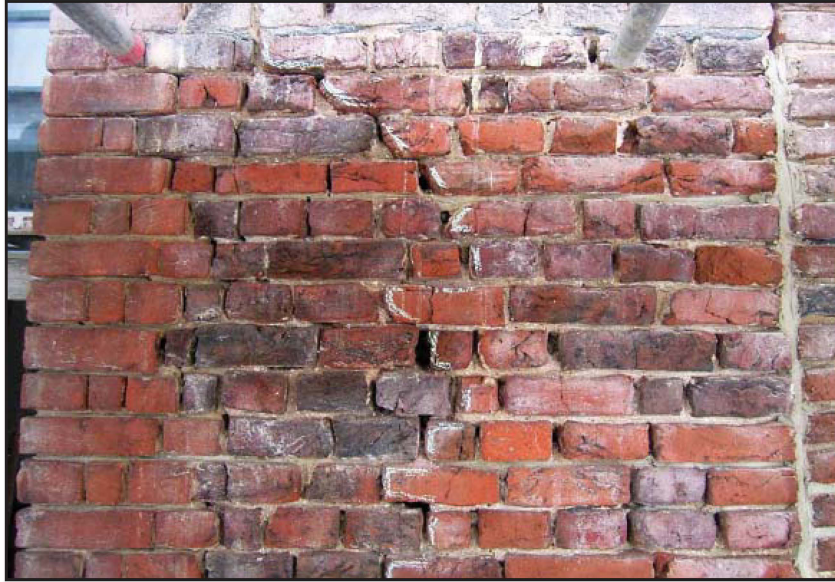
East elevation, external view, second floor, showing late 17th - early 18th century infill to 17th century window
